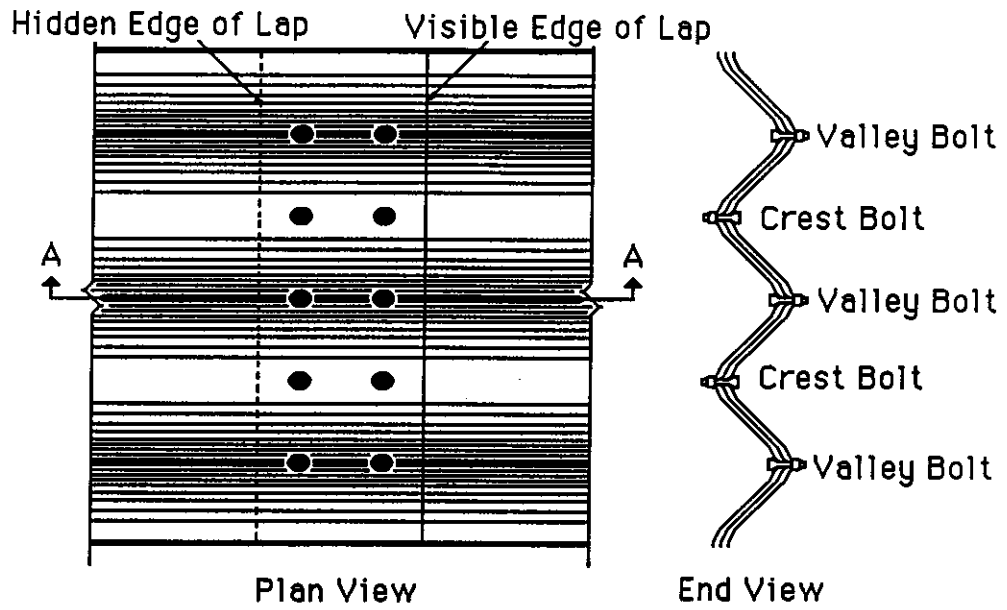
Bolting Arrangement for Specimen 7I4M
